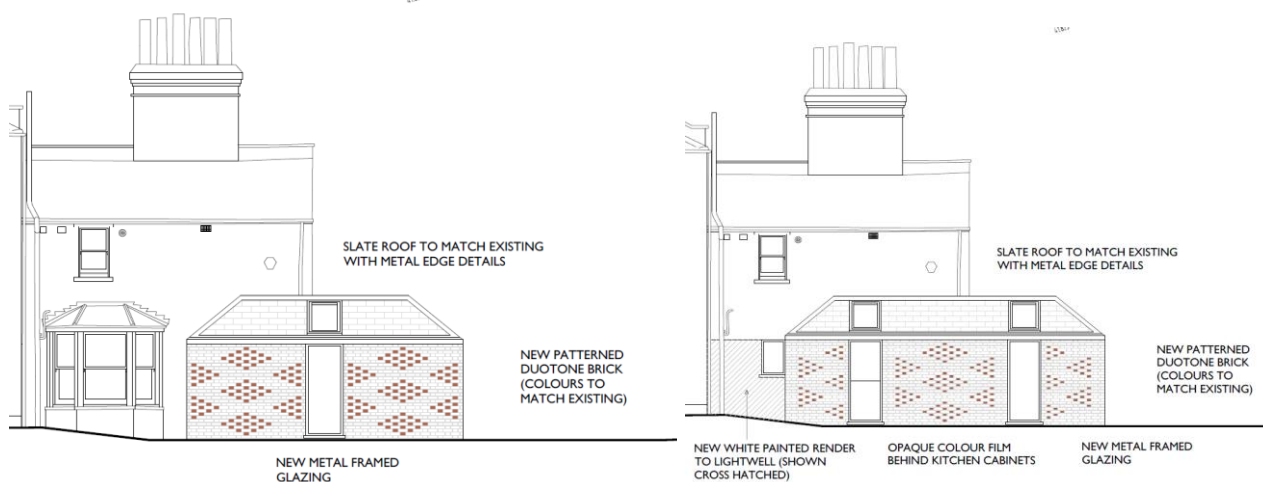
Side elevation of the current proposal (left) compared to the previously refused proposal (right)
